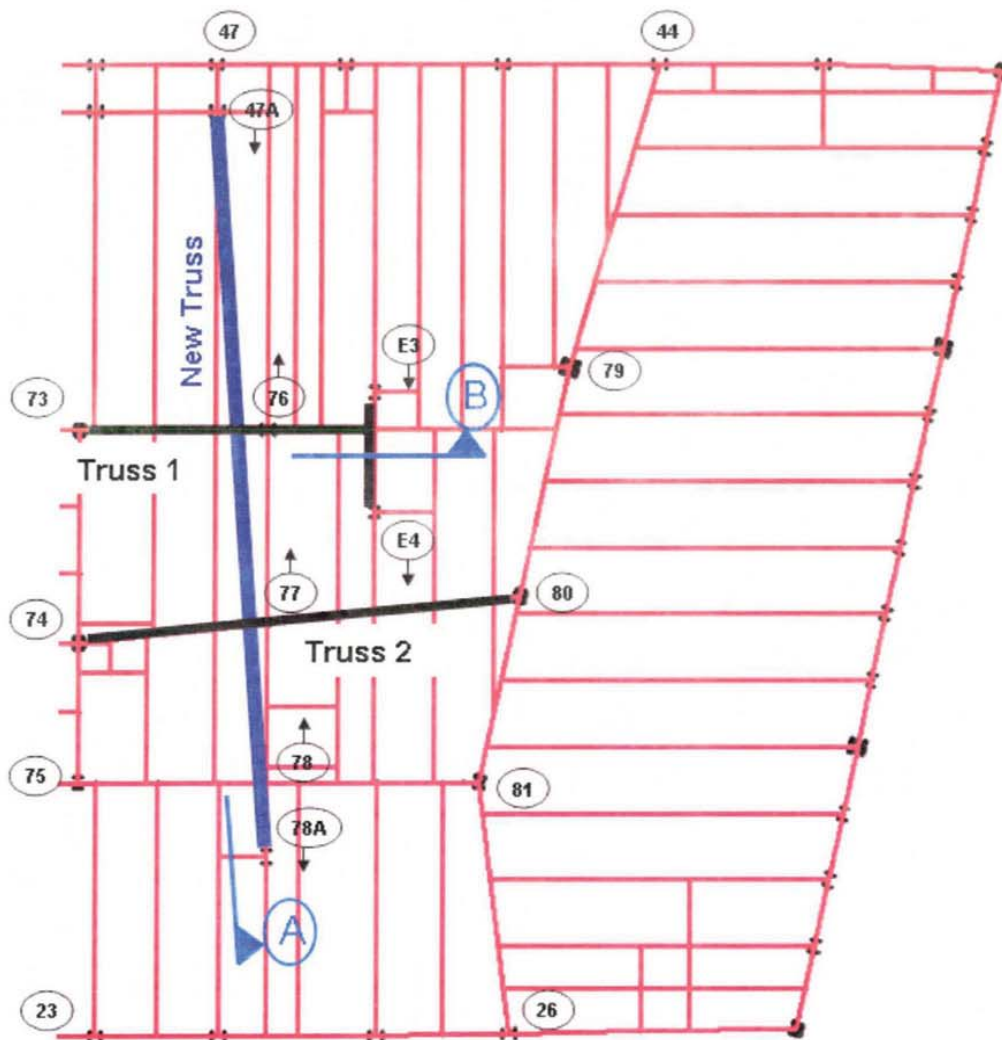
Location of proposed transfer truss on the 7th floor for an alternate design
